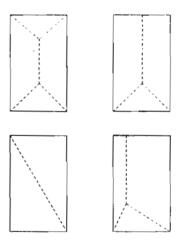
Failure Patterns of Concrete under Static Compressive Loading
